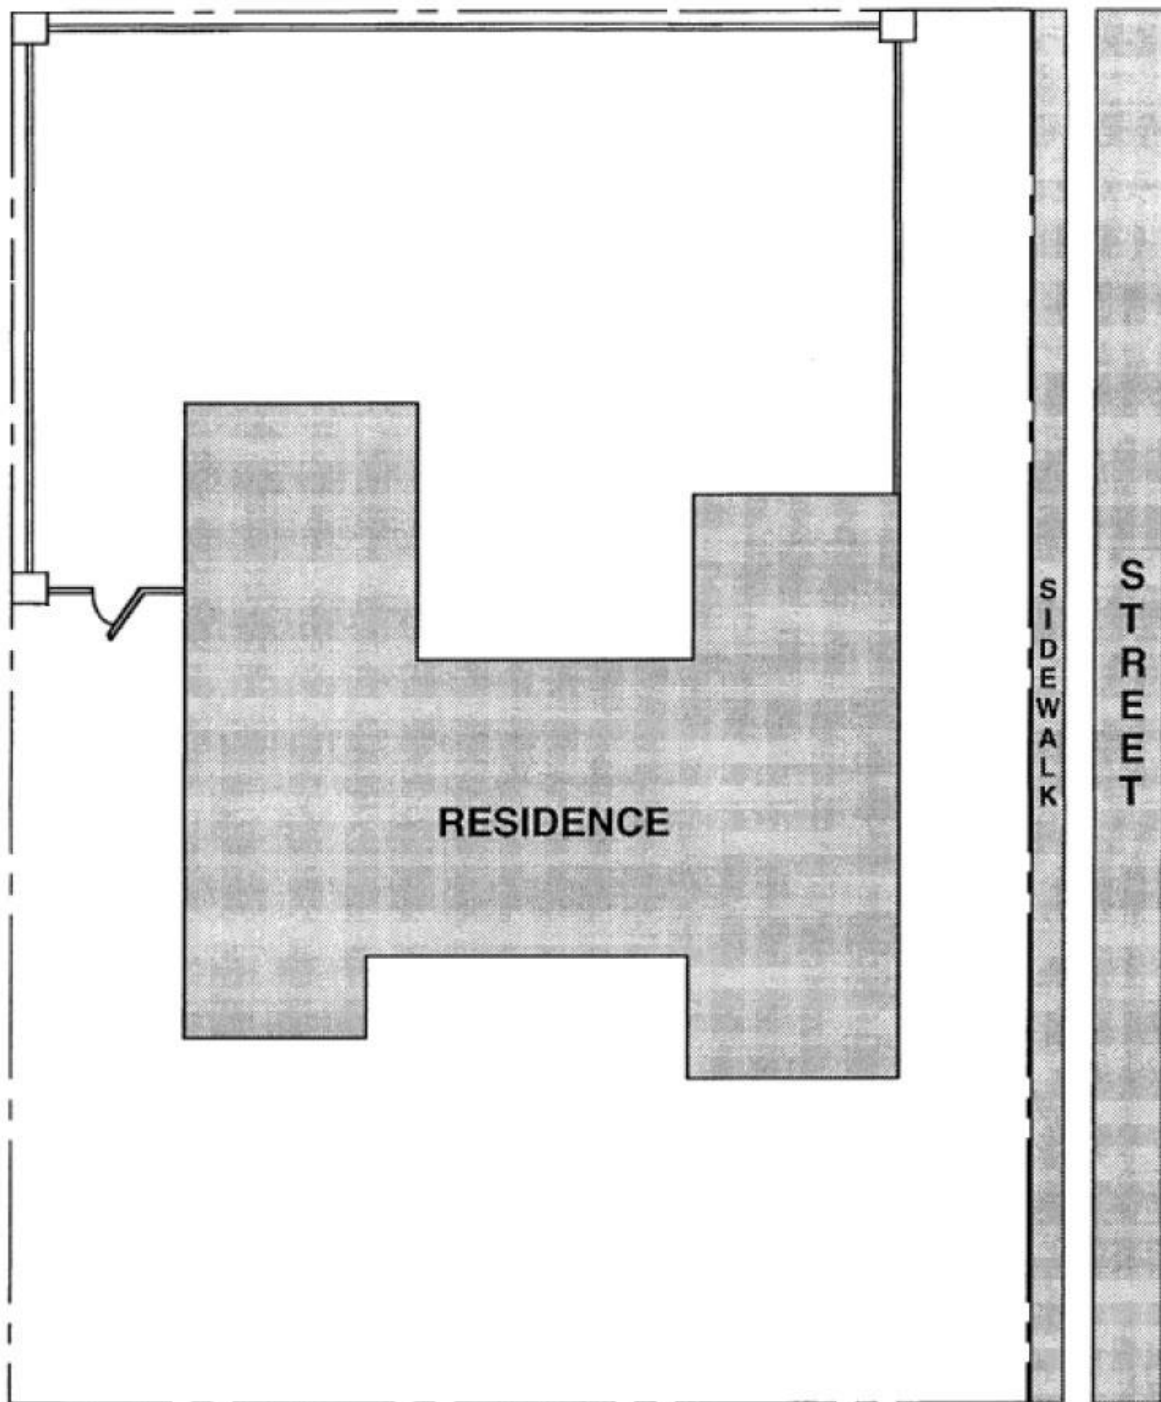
SUGGESTED FENCE SITE PLAN
